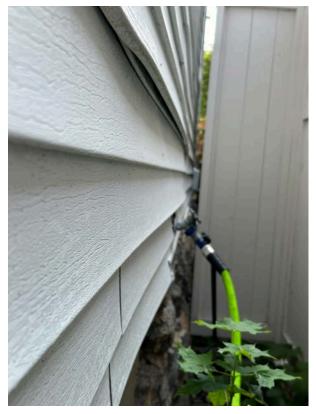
SEPARATED VINYL SIDING ALLOWING WATER INFILTRATION LEFT ELEVATION
